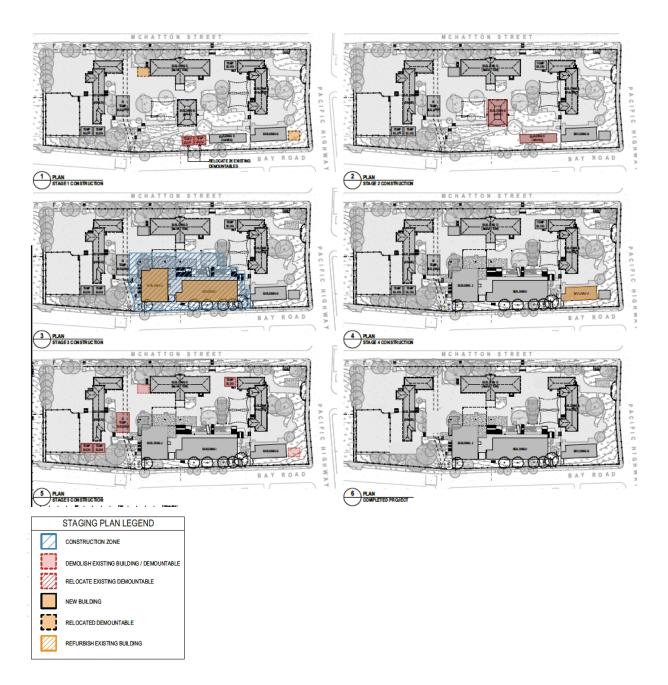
Extract of staging plan (Source: Fulton Trotter)
